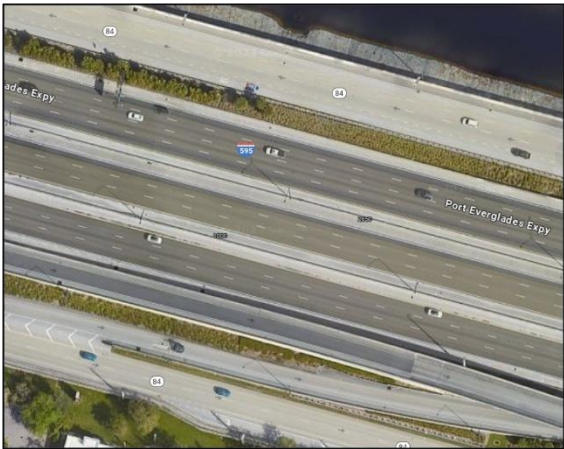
Site 3 – Concrete Barrier Separation (Three MLs) [Link-Concrete](#)
